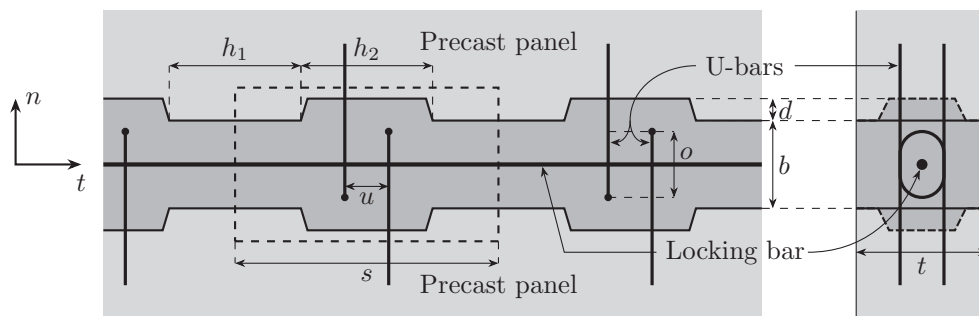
Elevation and cross section of a basic design of a keyed joint reinforced with U-bars.
